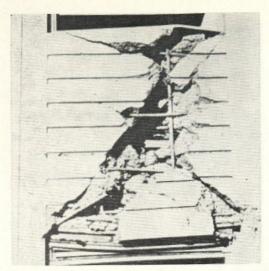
Detail of the X-Cracking in Exterior Reinforced Concrete Walls (6,10) (Courtesy of Pacific Fire Rating Bureau.)
